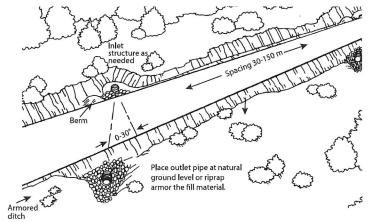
B. Installation of ditch relief culverts on an in-sloped road section. *Source:* Keller and Sherar 2003.
